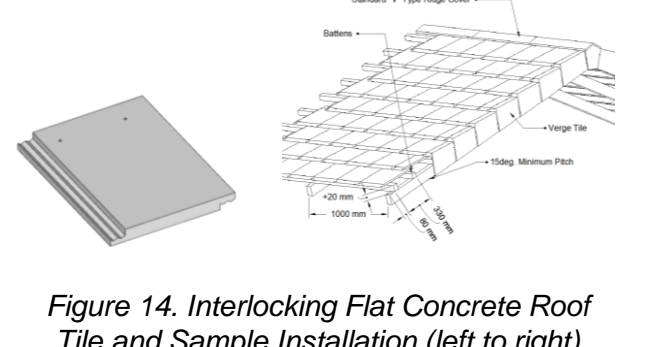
Interlocking Flat Concrete Roof Tile and Sample Installation (left to right)
